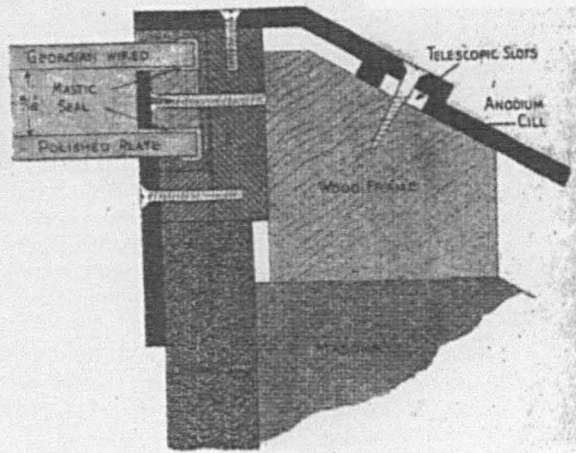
A SOUND PROOF OBSERVATION WINDOW TO STUDIO 6A AT BROADCASTING HOUSE
